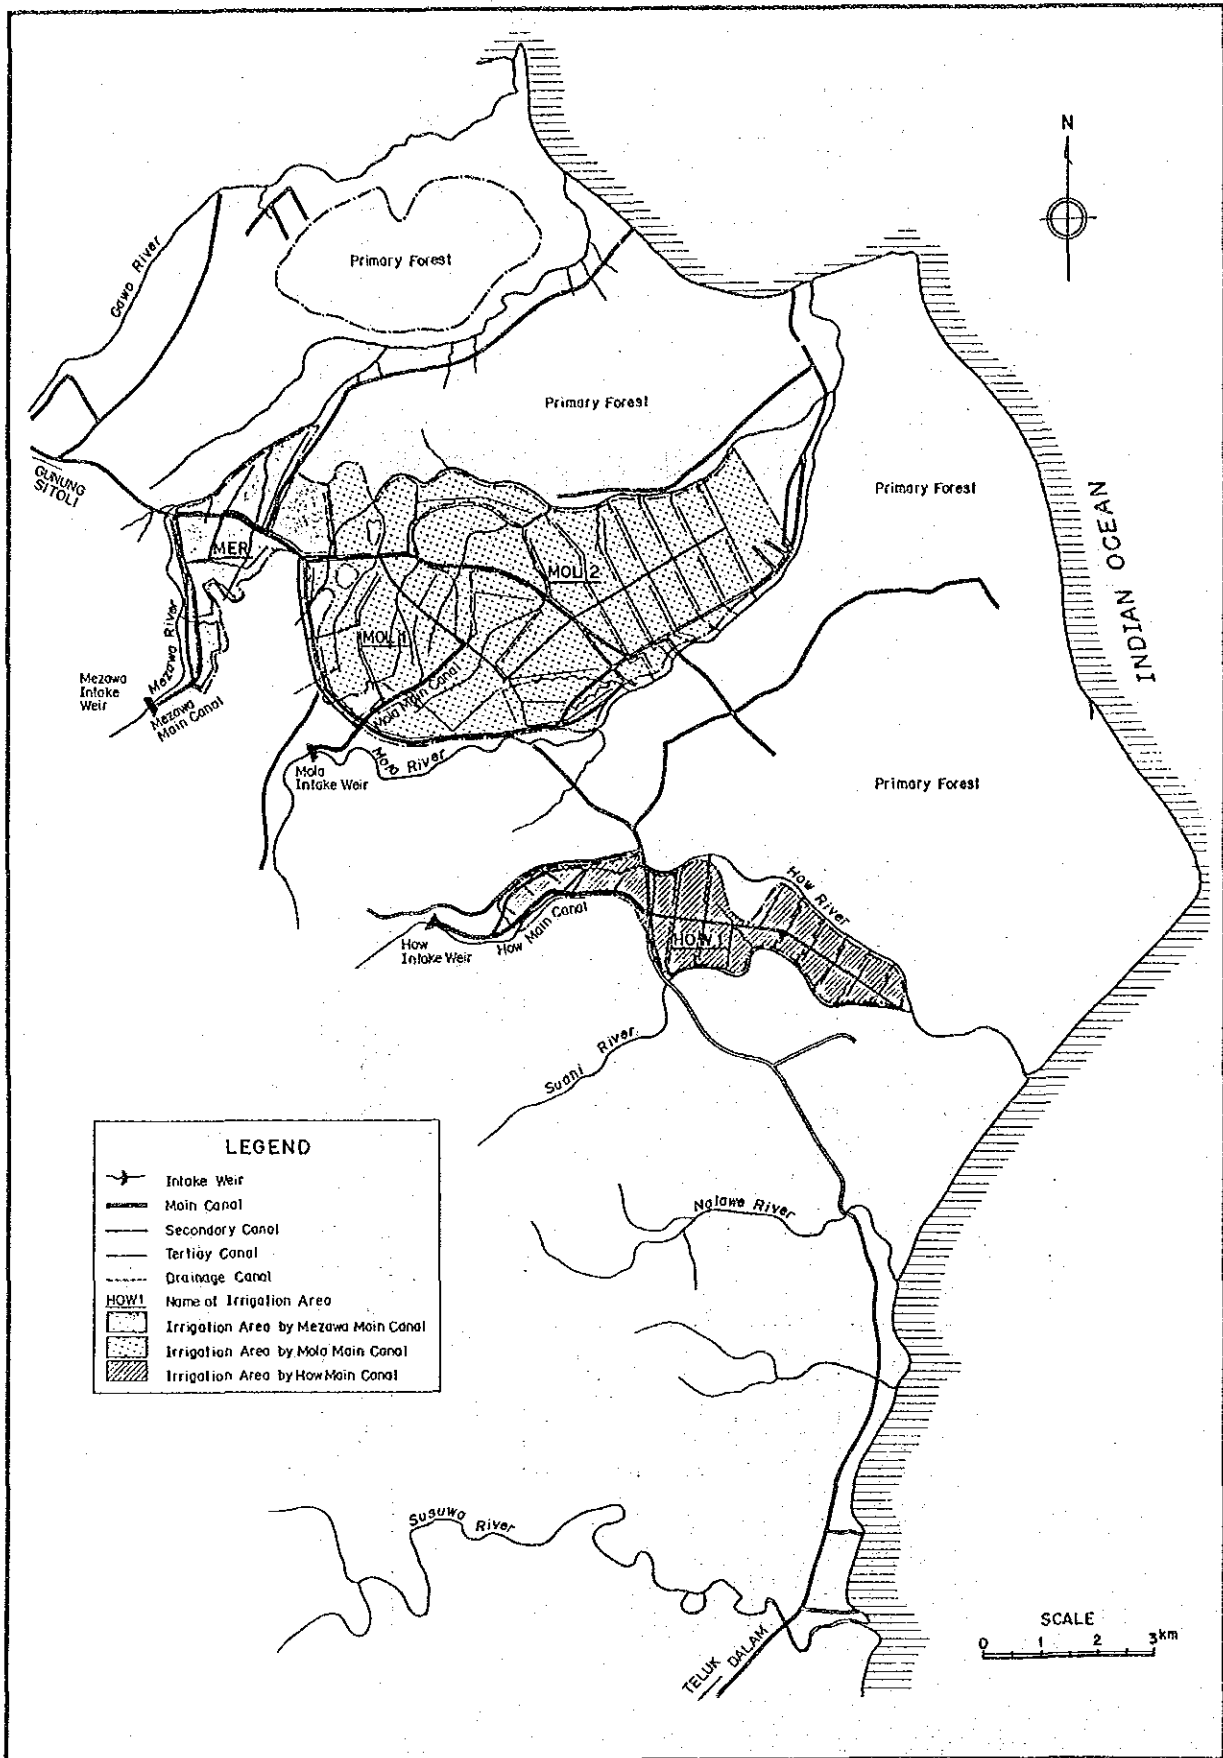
Proposed Canal Layout of the Alternative Development Project
